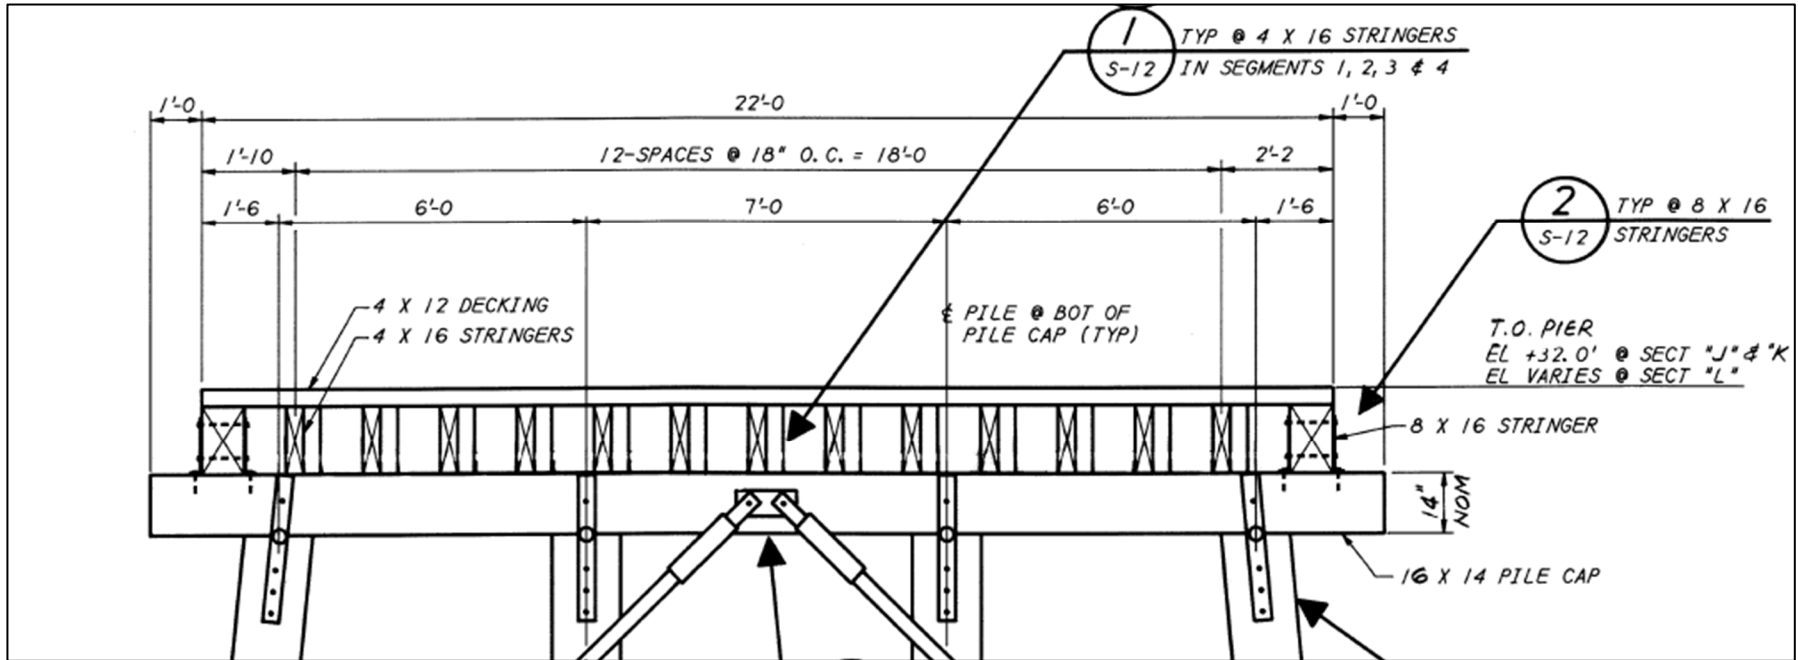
Existing Typical Elevation, reference Section J/K/L on S-10.
